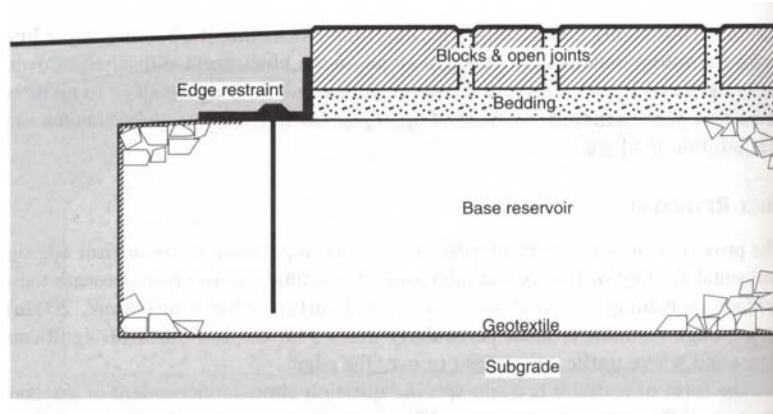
Typical Paving Stone Cross-section (Ferguson, 2005). Paving stones, or blocks, are separated by sections of pervious materials to allow for infiltration of water.
